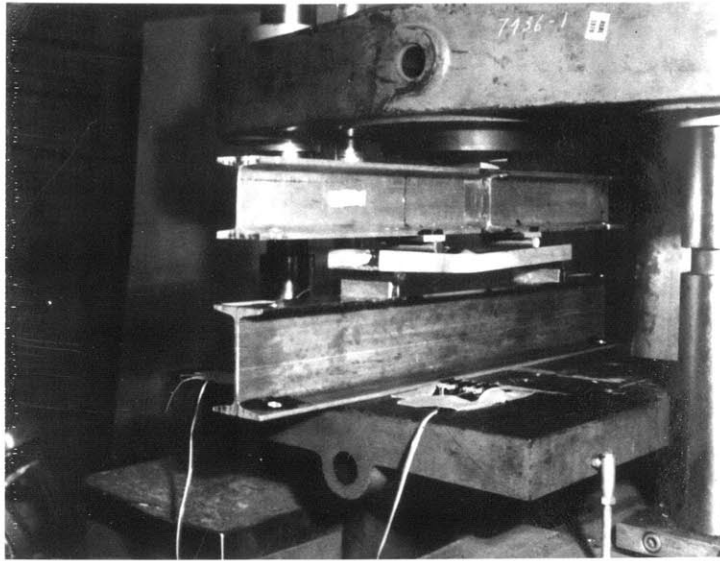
SANDWICH BEAM 3 IN TEST JIG AFTER FAILURE
